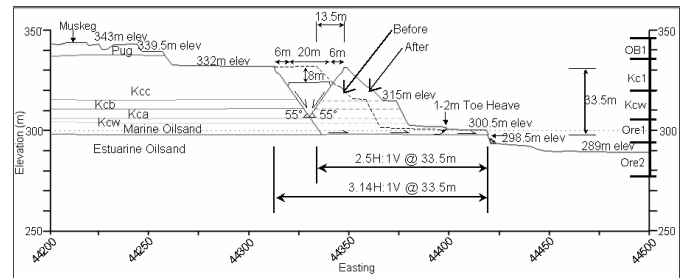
Failed Slope Geometry of G-Pit Triple Bench Failure
